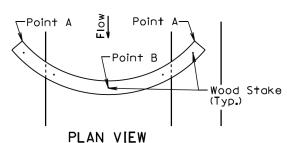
DETAIL B (TYPICAL OF ALL INSTALLATIONS)
